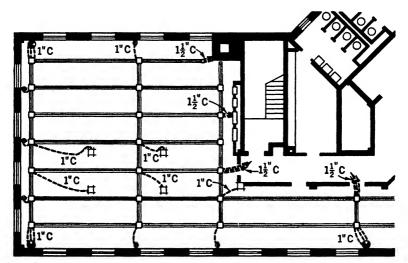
A typcial layout of connection boxes and rectangular raceways for a 3-duct Walker underfloor system. Note the round-conduit connections (dashed lines) for wall and column outlets and for home-run connections to sources of supply in panelboards, etc.
